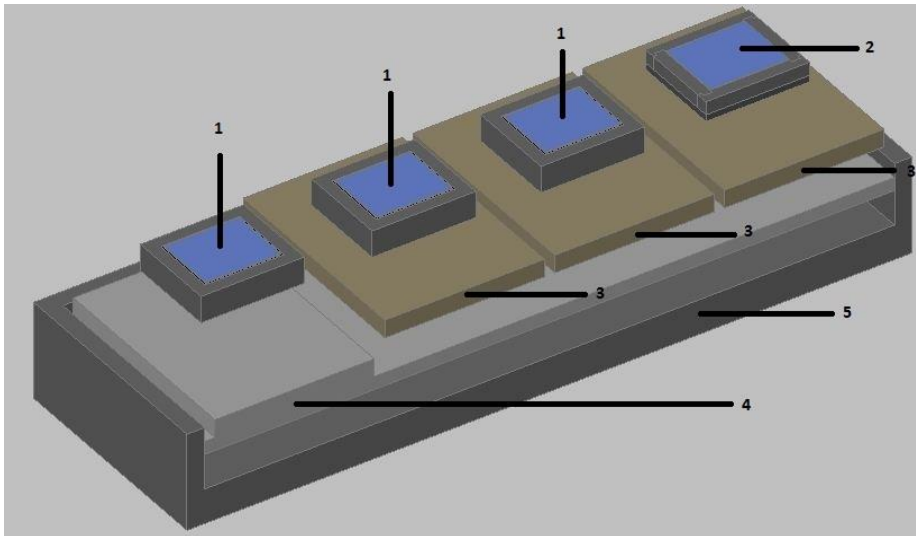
Chart. Three dimensional disintegrated layout of the testing pit
